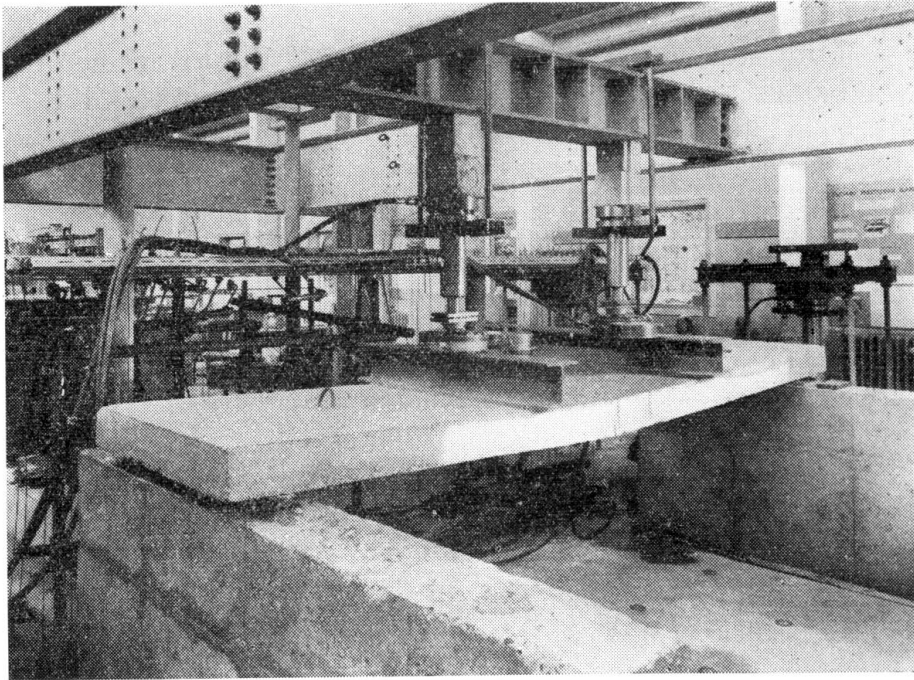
Condition at maximum load of a slab with six mild steel bars
